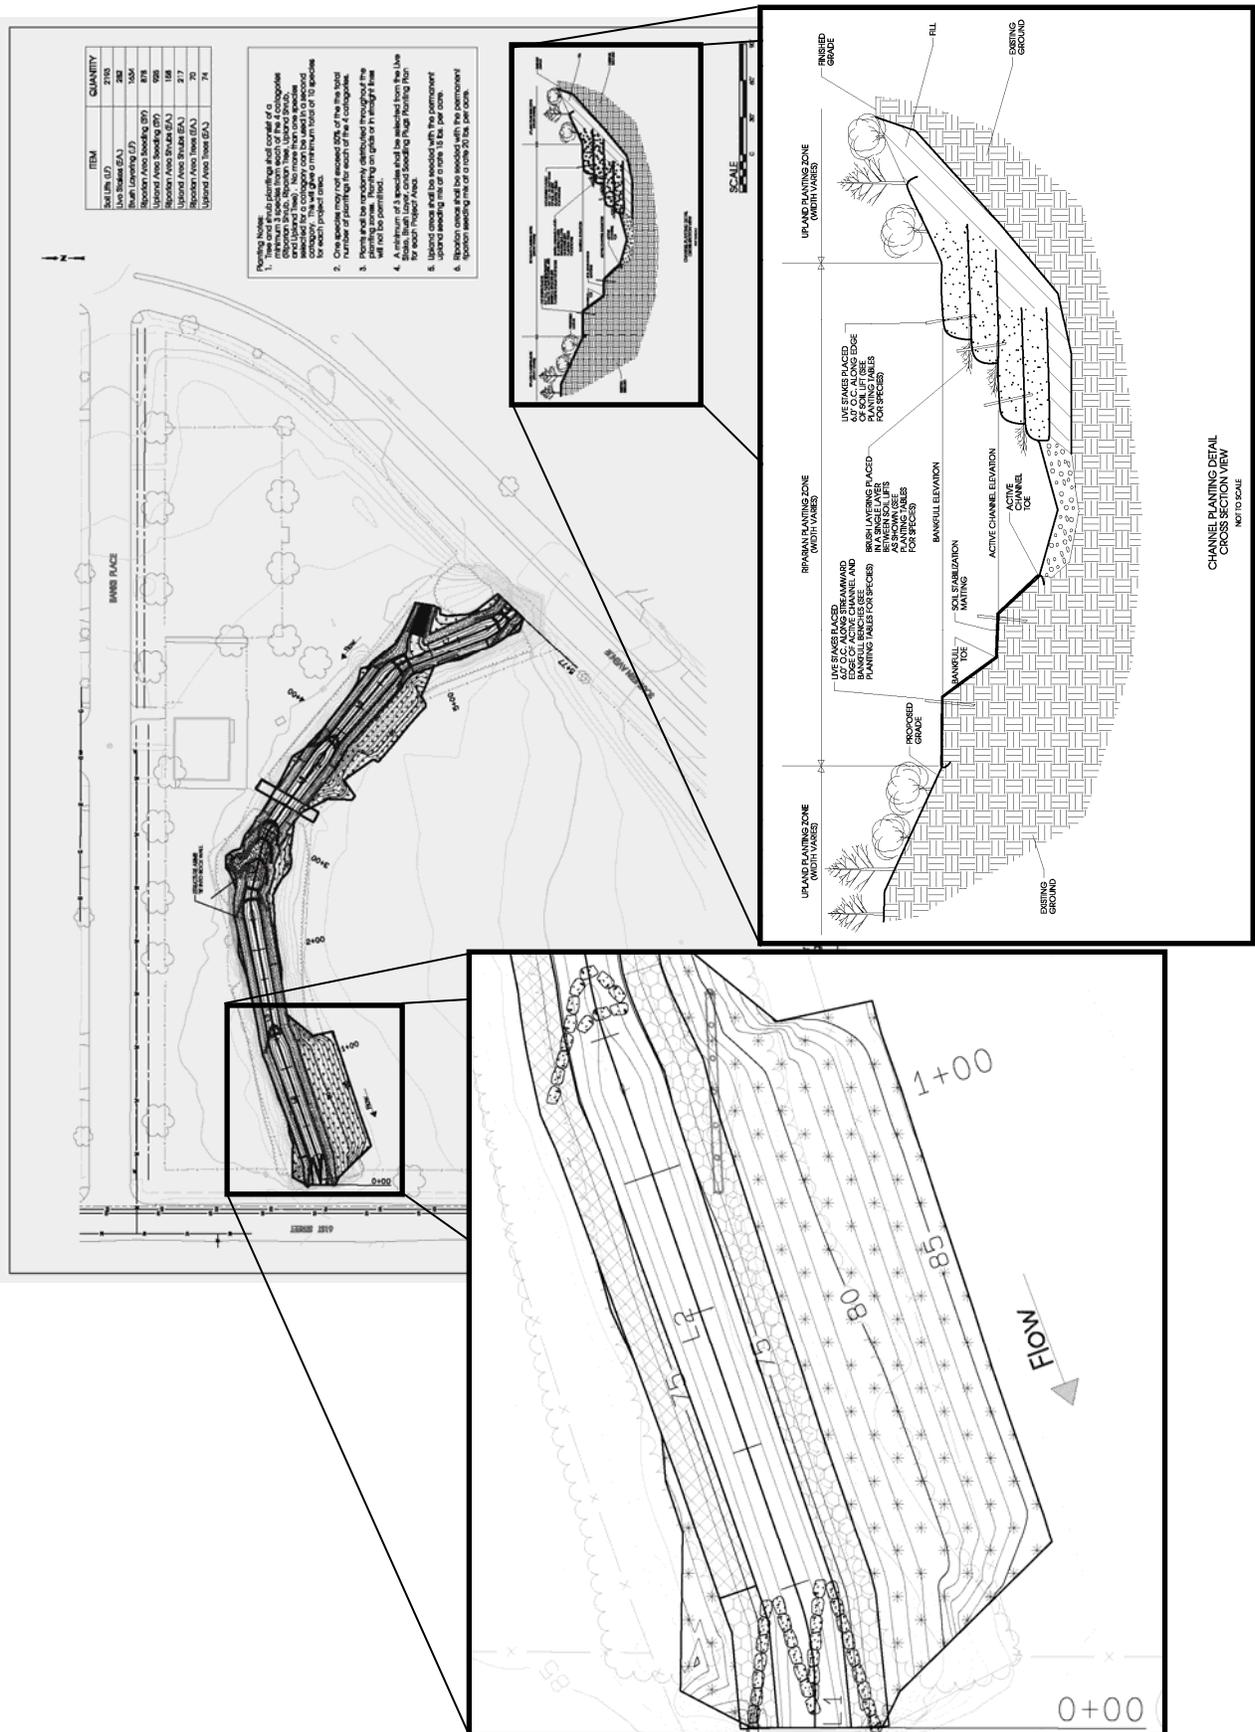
Example of planting plan with enlargements of cross sectional planting detail and planting zones
